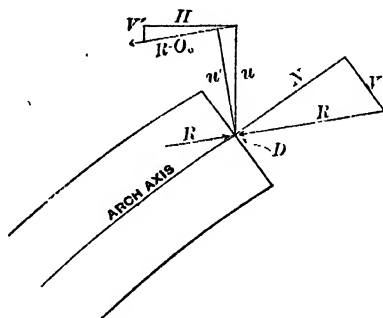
Forces Acting upon an Arch Section. (See p. 550.)
